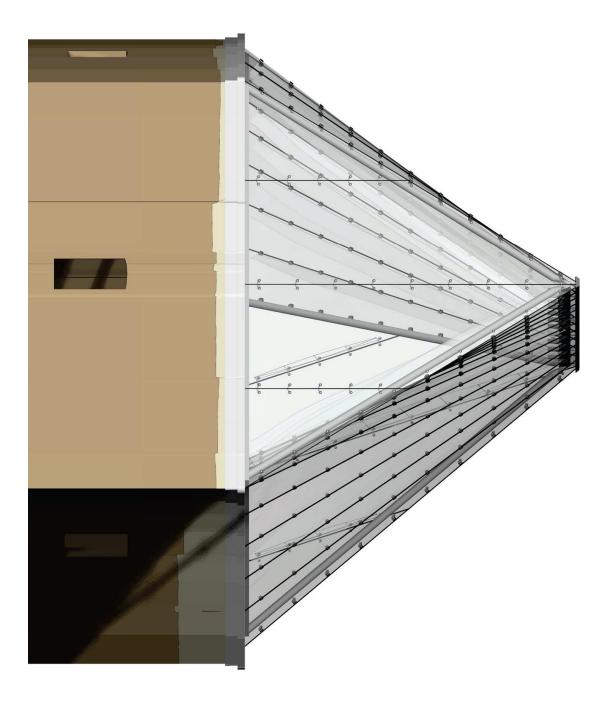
North elevation 1:100 of the glass roof design. Source: own ill.
